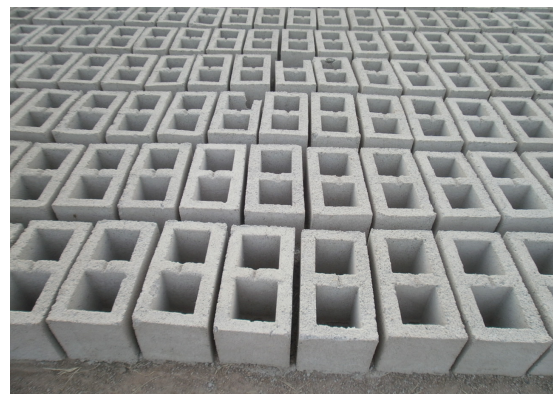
225mm wide concrete blocks. The larger sizes are mainly used to construct load bearing or external walls laid in stretcher bonds. Source: Fieldwork January 2012
